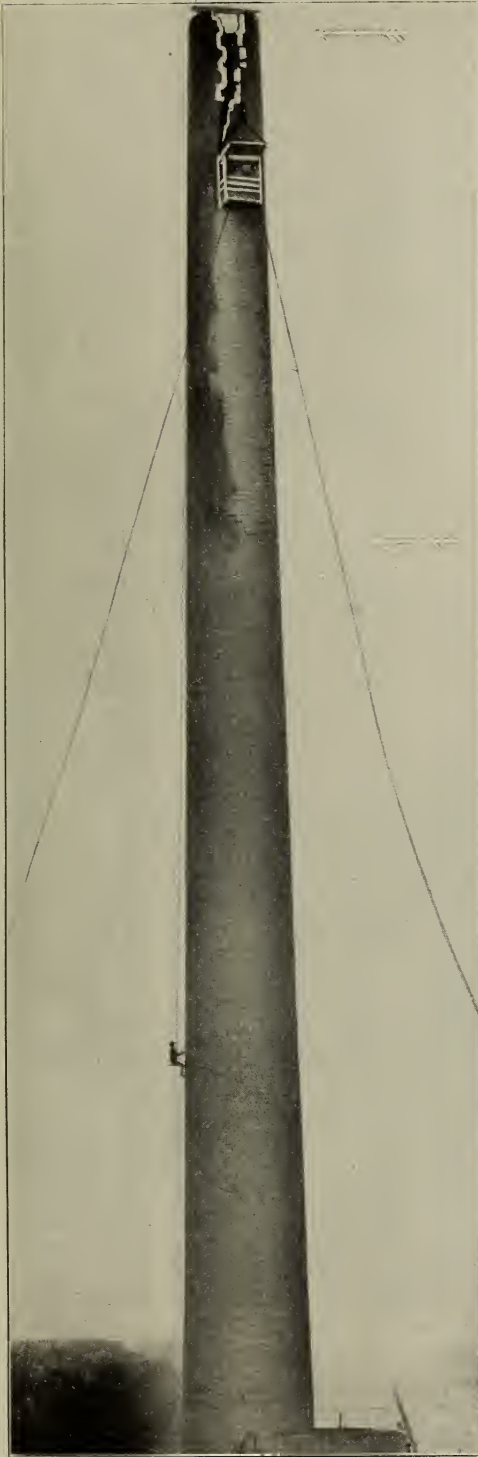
310 FOOT CHIMNEY DAMAGED BY LIGHTNING.
